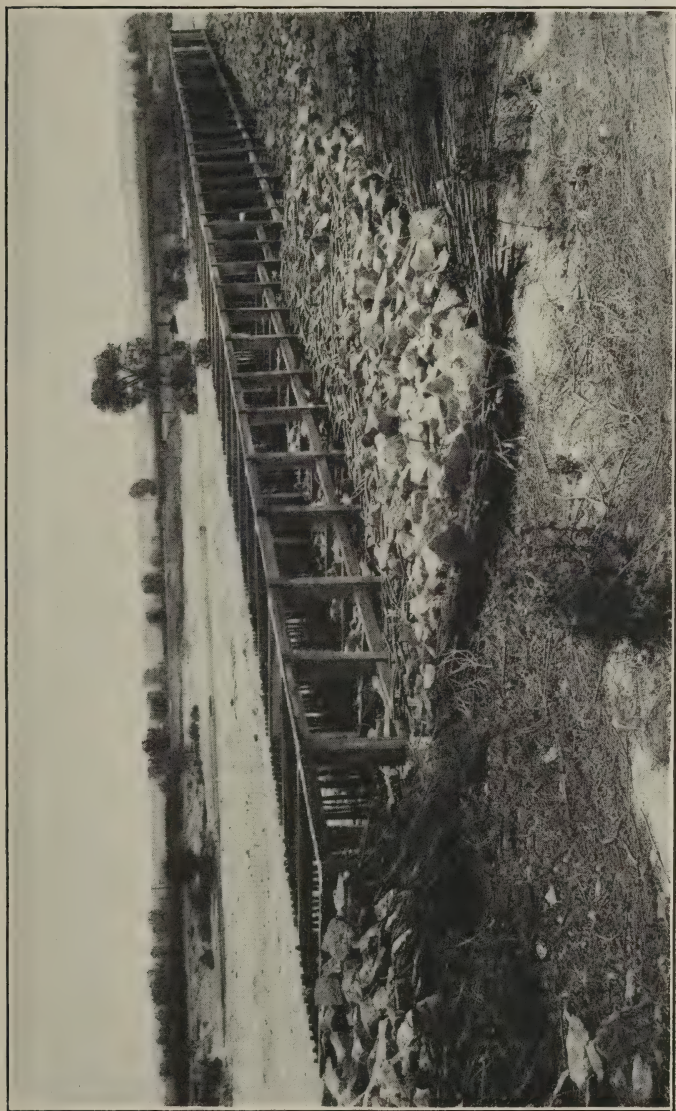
Lower concrete dike, Fort Riley, Kans. Looking downstream from river side.
